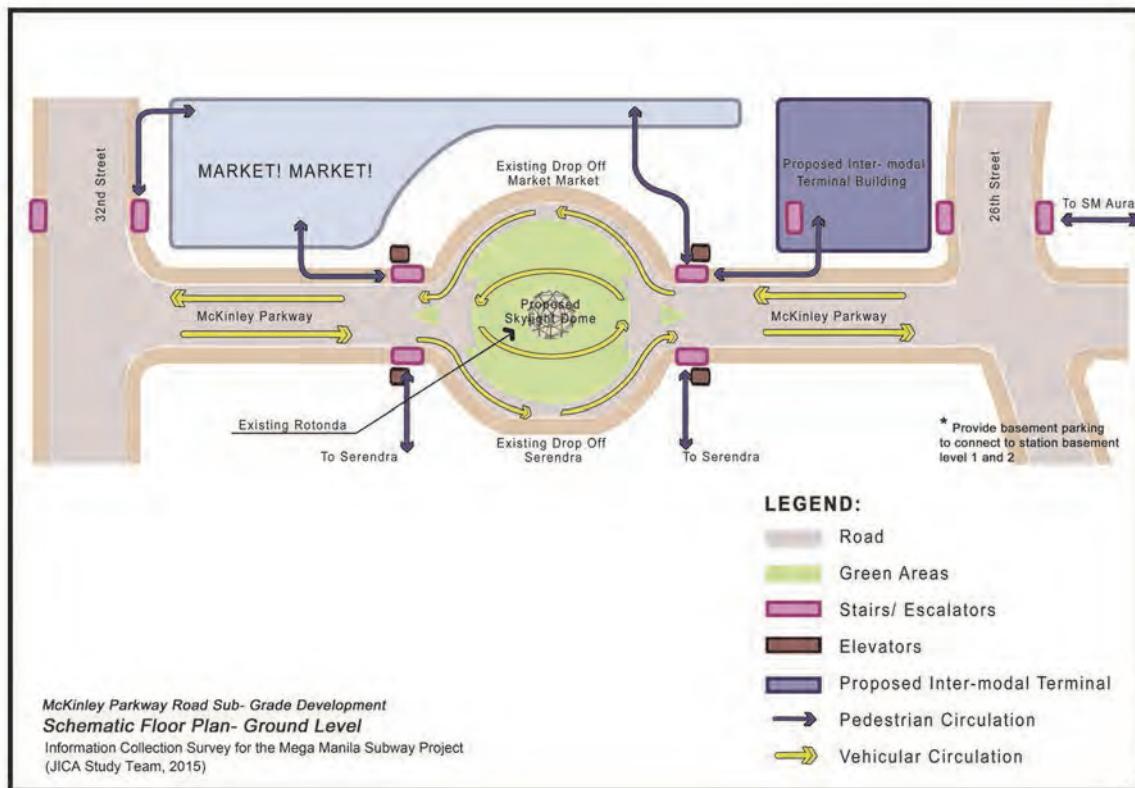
Cross-sectional Plan of MMSP Station in BGC
